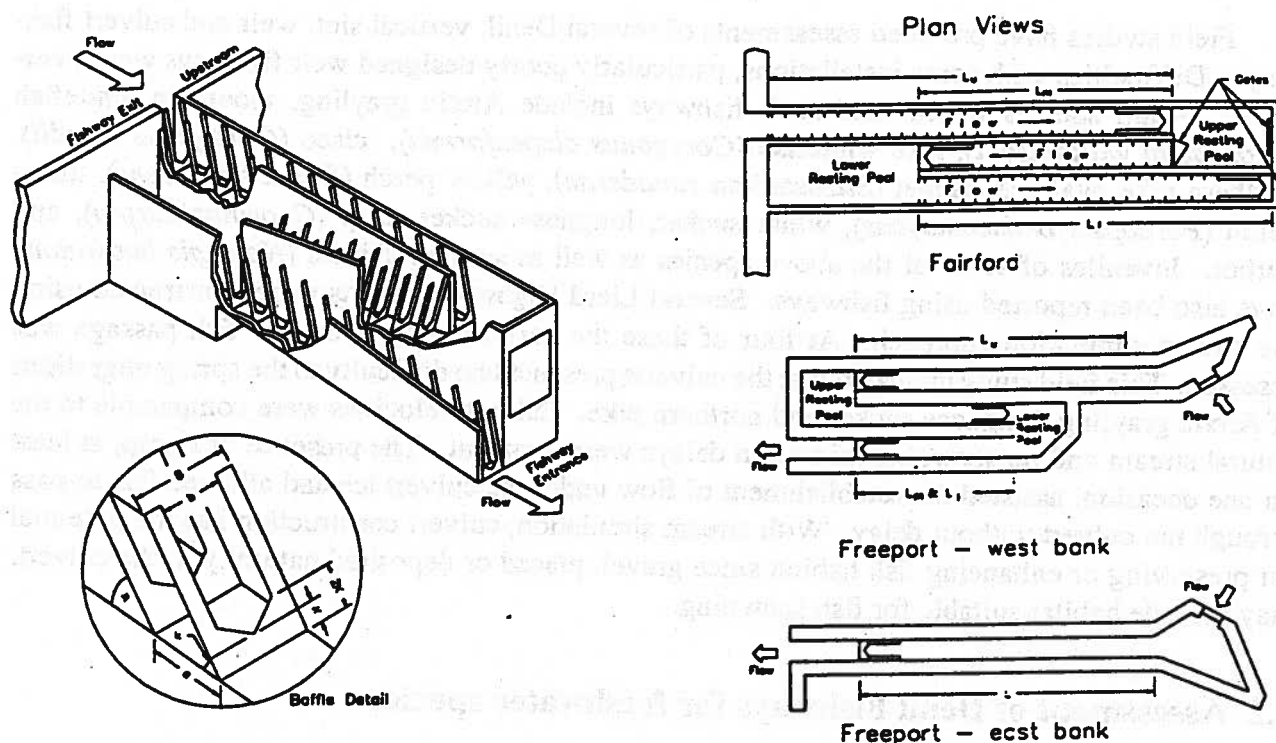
Isometric and plan views of Denil fishways at Fairford and Freeport.
